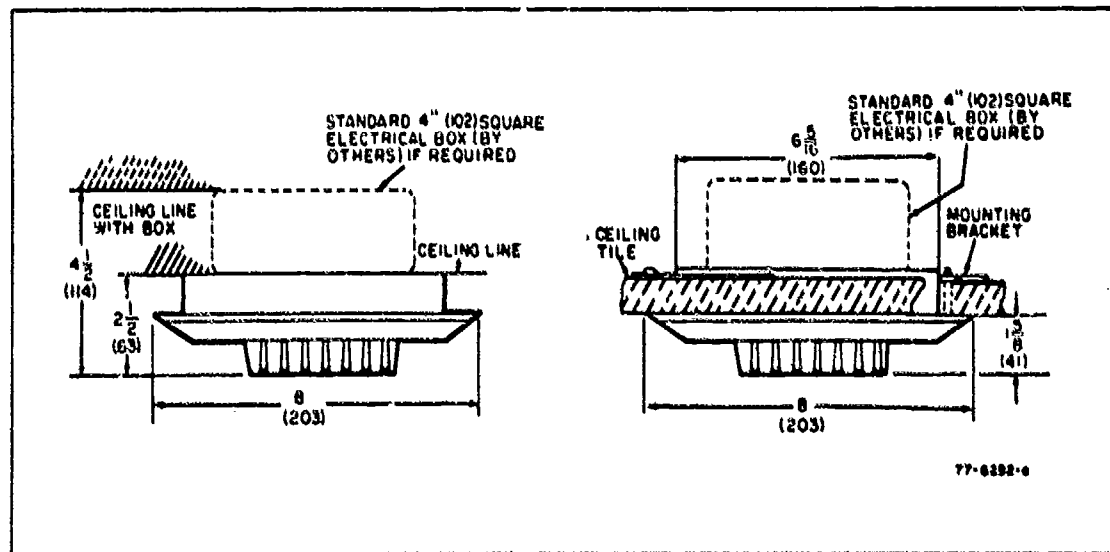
TC100A APPROXIMATE DIMENSIONS IN INCHES (MILLIMETERS)
